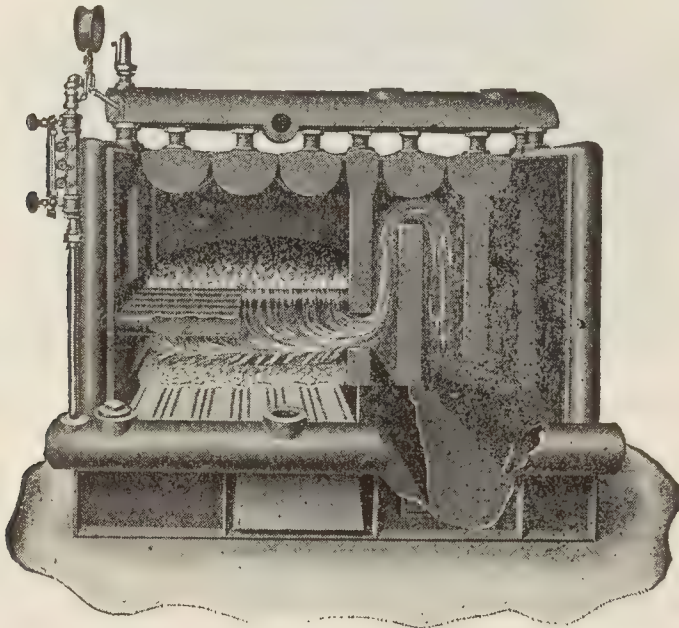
,637.—Gurney sectional boiler showing heating surface, long fire travel and horizontal arrangement of water tubes. Cut also shows method of dividing each section into half sections—a construction which insures freedom from breakage through sudden expansion or
